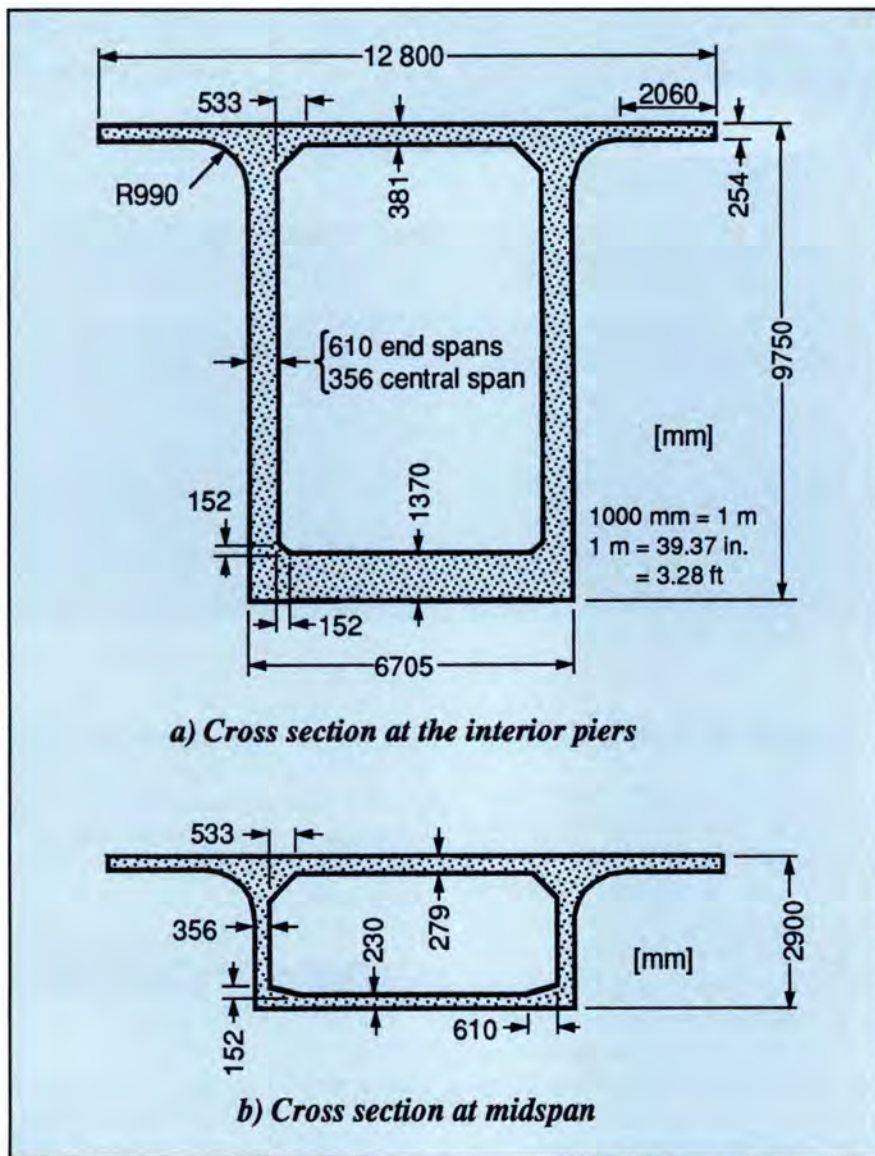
Cross sections of the Grand-Mère Bridge at interior piers and midspan.
